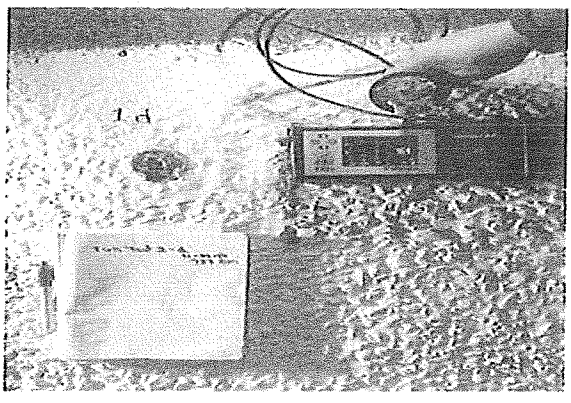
c section 8 wall dolly fell off before glue dried re- set dolly in new area of same section. Will pull test on 11-15-2016.
